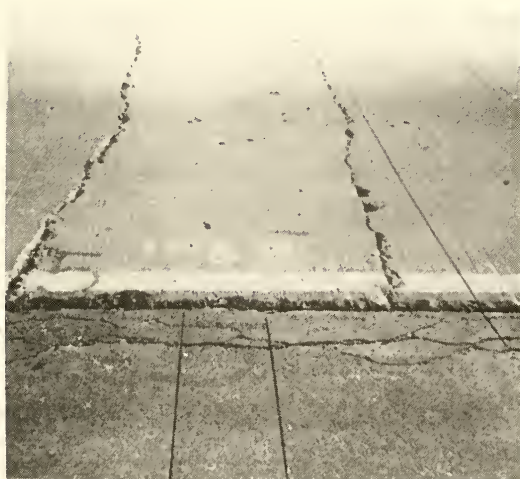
POTENTIAL FAILURE UNDERSEALED ON SBL AT STATION 1088+20. THIS CONCRETE WAS LATER REMOVED AND REPLACED WITH A CONCRETE PATCH.
